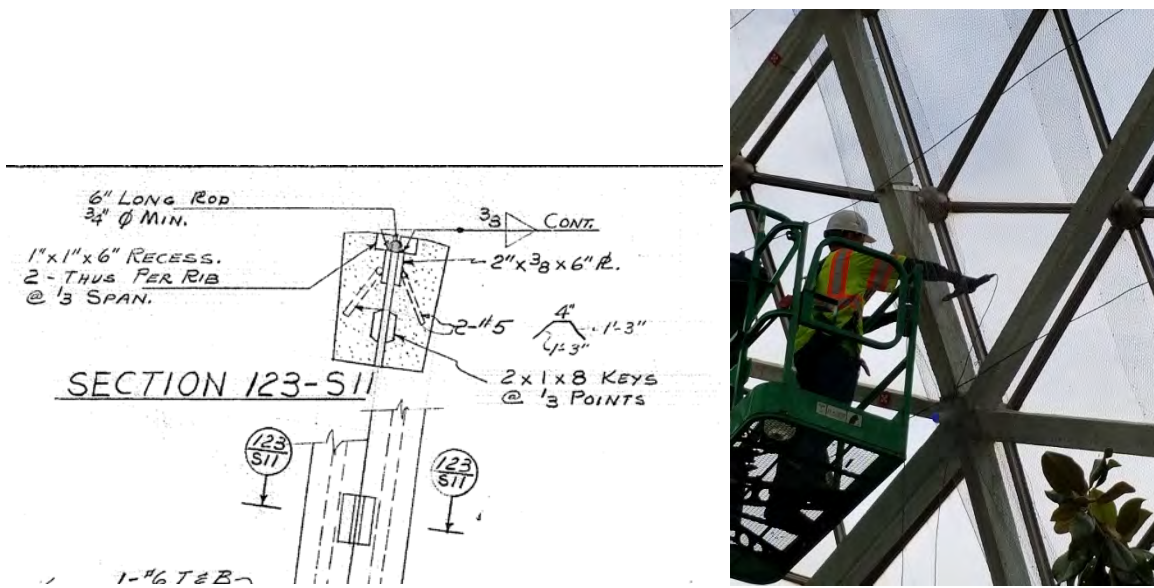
Vertical Sector-to-Sector Connection Detail and Test Arrangement
